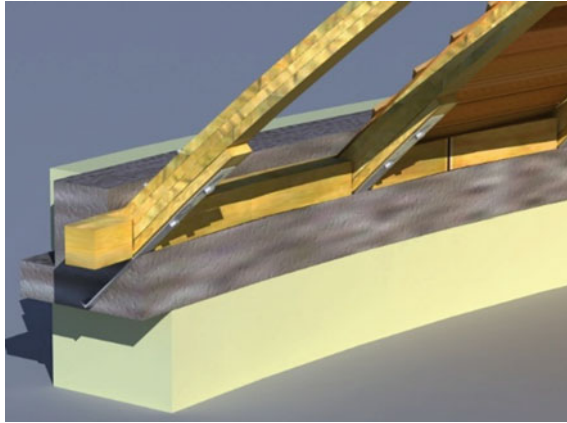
Connection of ribs with the wall plate and the lower reinforced concrete crown
